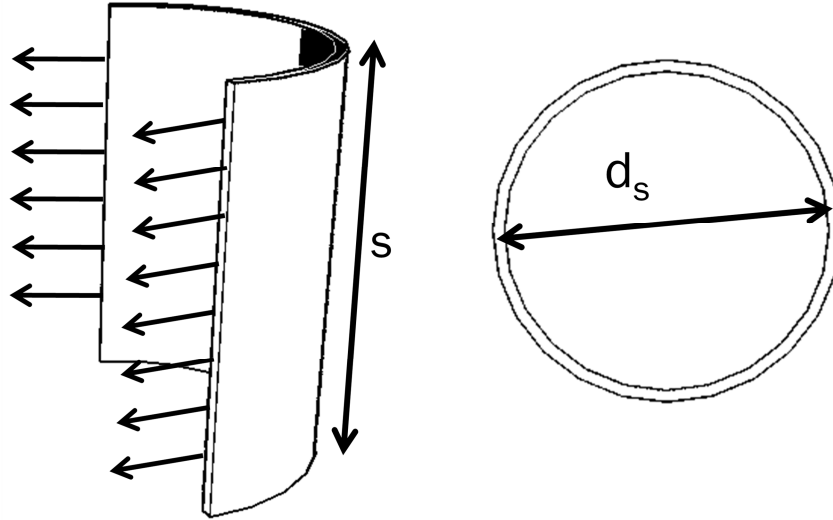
3D Sectional elevation and plan for CFST column.
